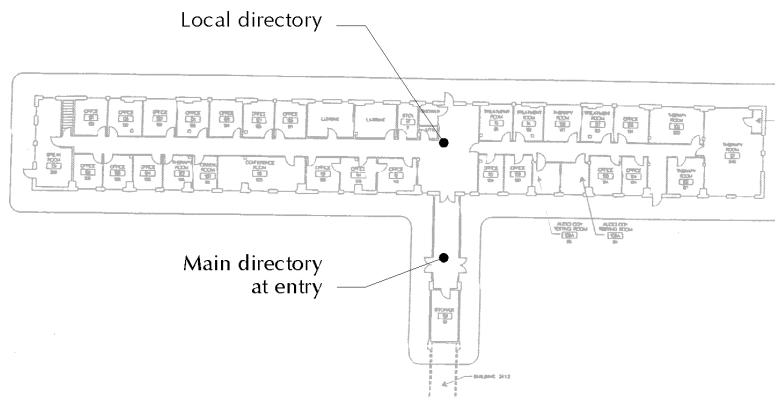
Heidelberg Hospital, Entry Floor Plan of Building 3613; showing typical location of primary signage elements.
